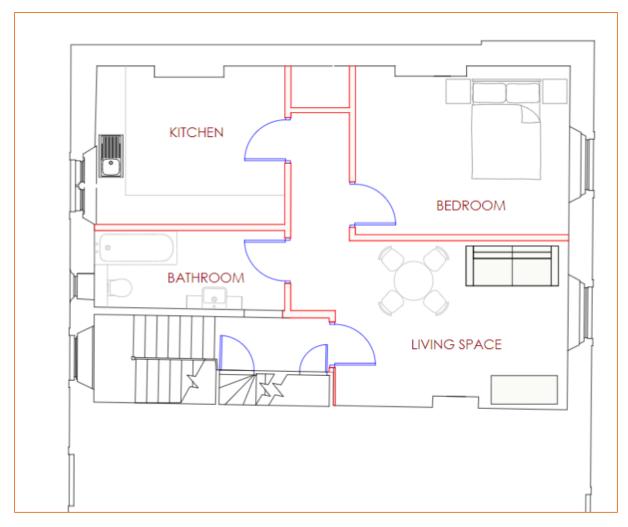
Proposed second floor plans for the development (Source: hdp associates)
